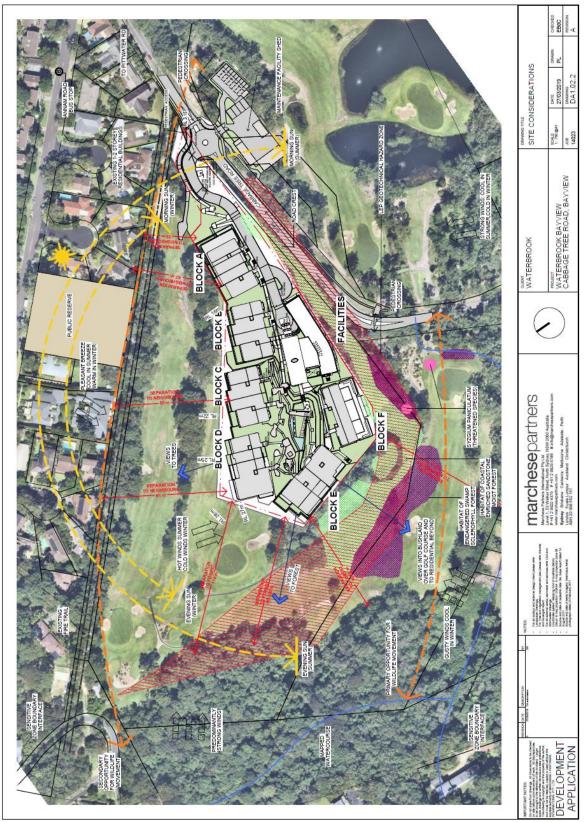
Site Considerations plan by Marchese Partners, Job No. 14023, Drawing No. DA1.02.2 Rev A
